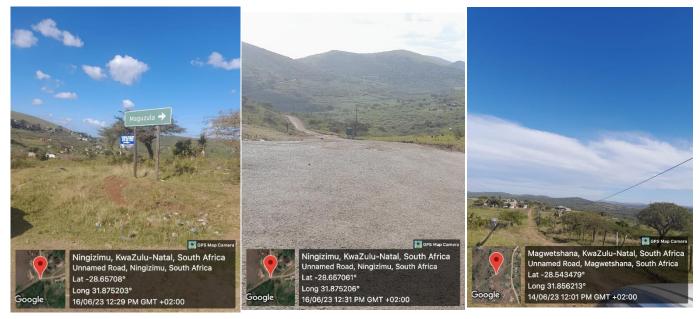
Access road to the proposed site (Singo Consulting (Pty) Ltd, 2023)
